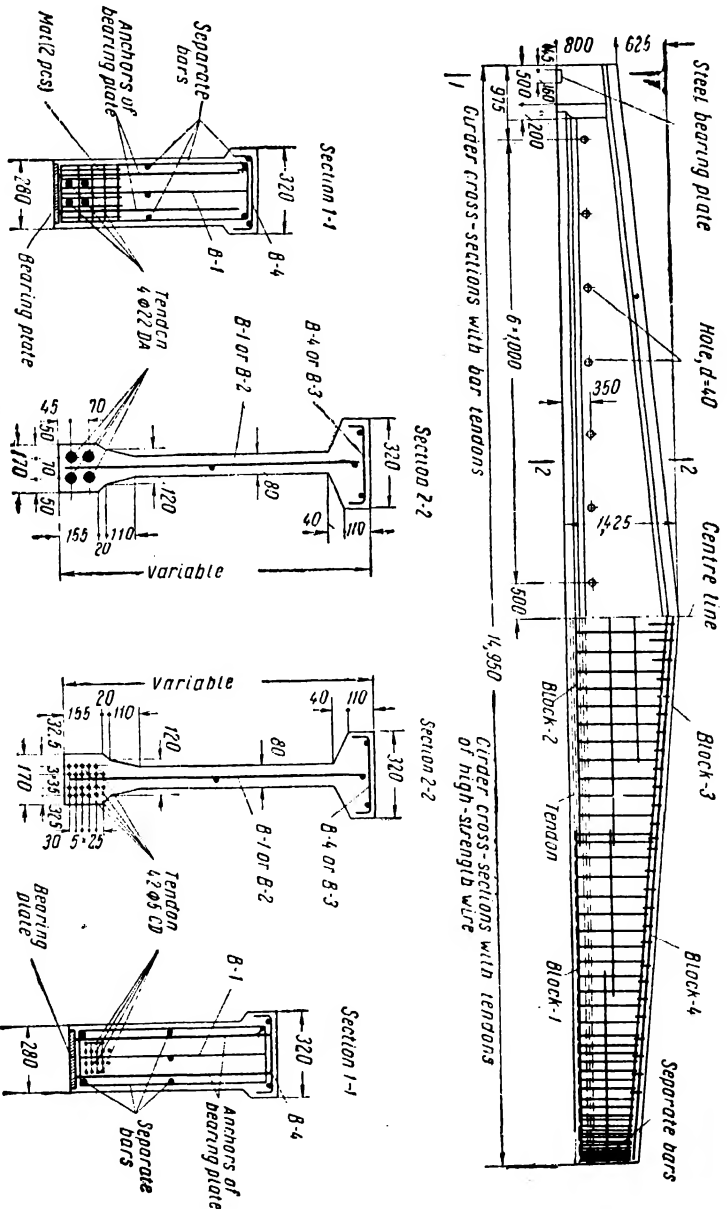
A prestressed girder with tendons tensioned against abutments
